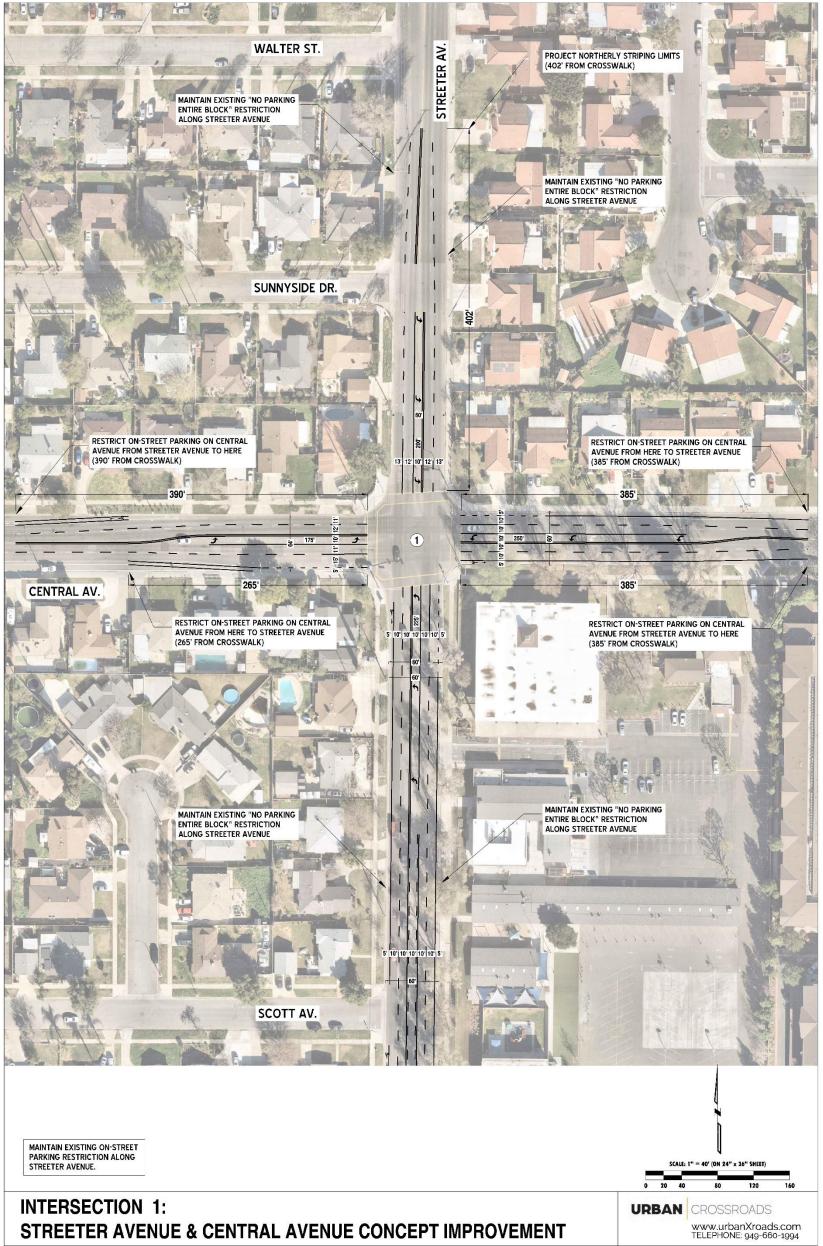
CONCEPT STRIPING PLANS (PAGE 1 OF 4)
